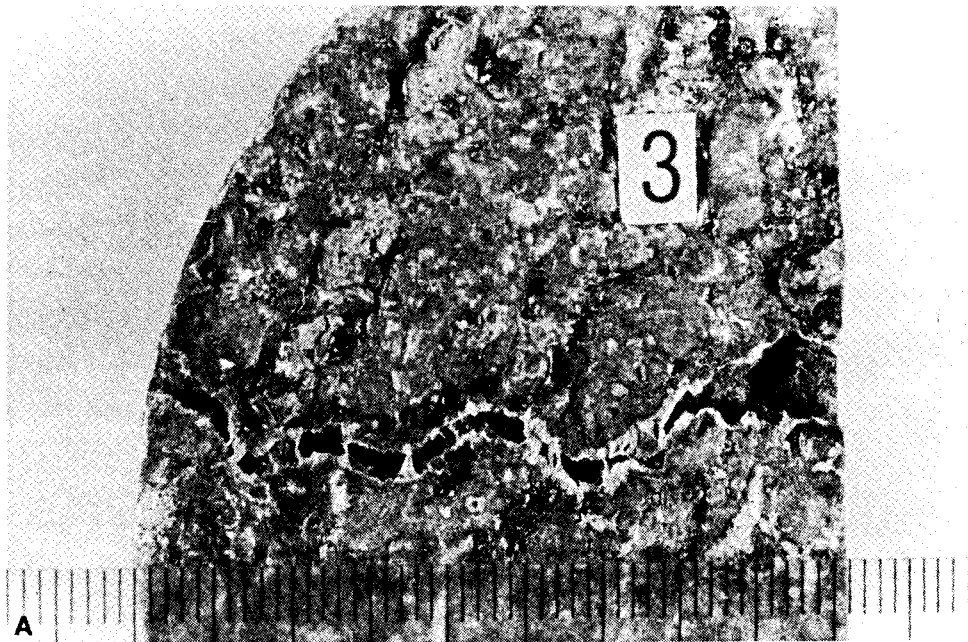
PLASTIC SHRINKAGE CRACKING. Occurred in a latex-concrete overlay. The crack shows the distortion that accompanies tension cracking in an unhardened medium. This specimen was collected before traffic destroyed these delicate structures. The scales are in millimeters. A. Top view of core. Little threads of latex span the crack. B. Little bridges of latex paste connect sides of crack.
